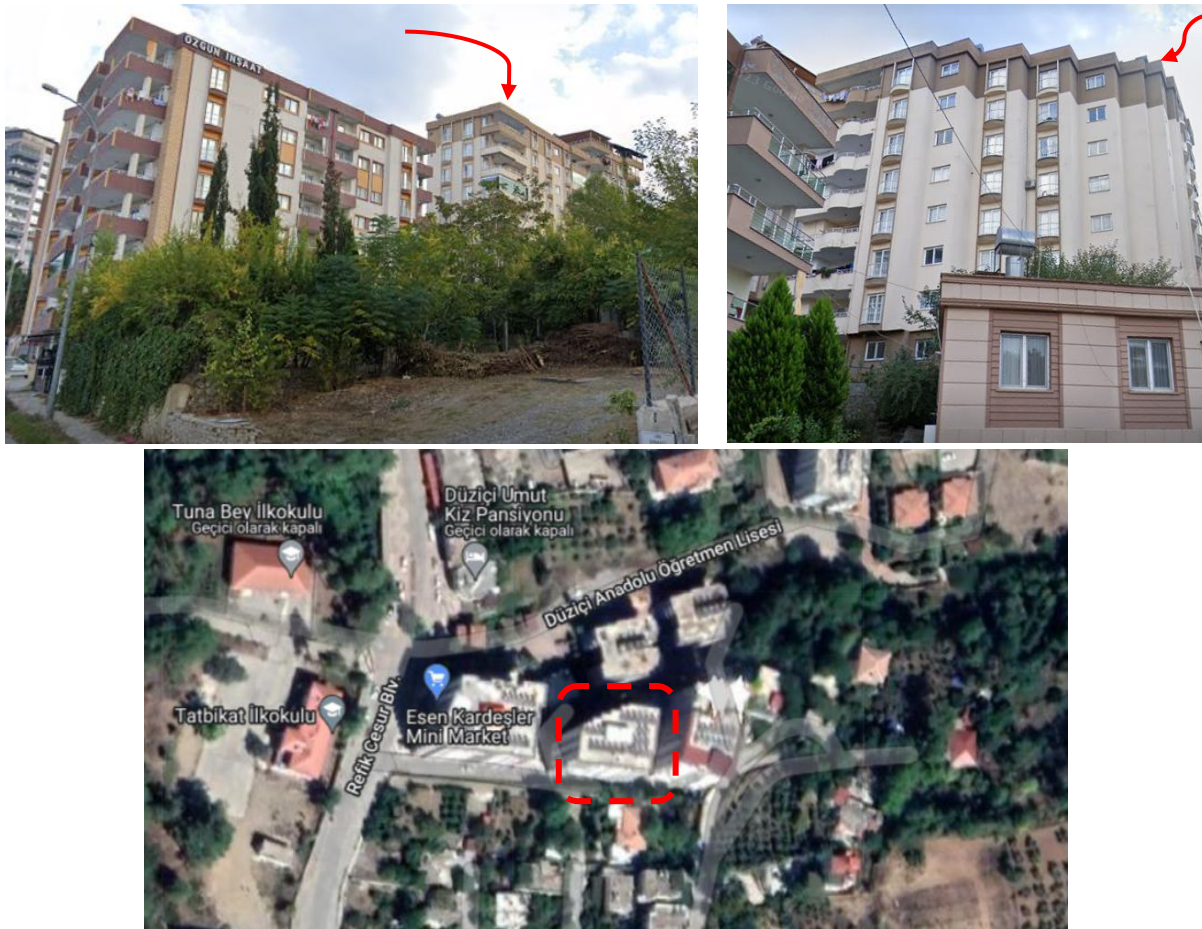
Various visuals of the reinforced concrete building measured (URL-1)
